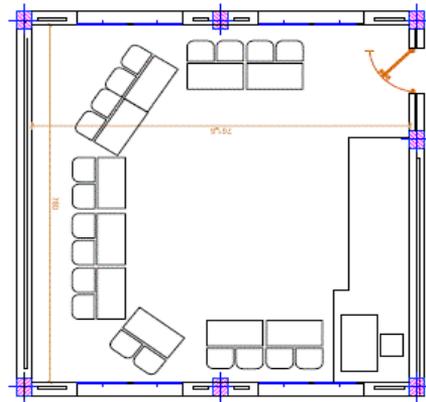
Observed classroom with a U-shape layout. Source: Authors
